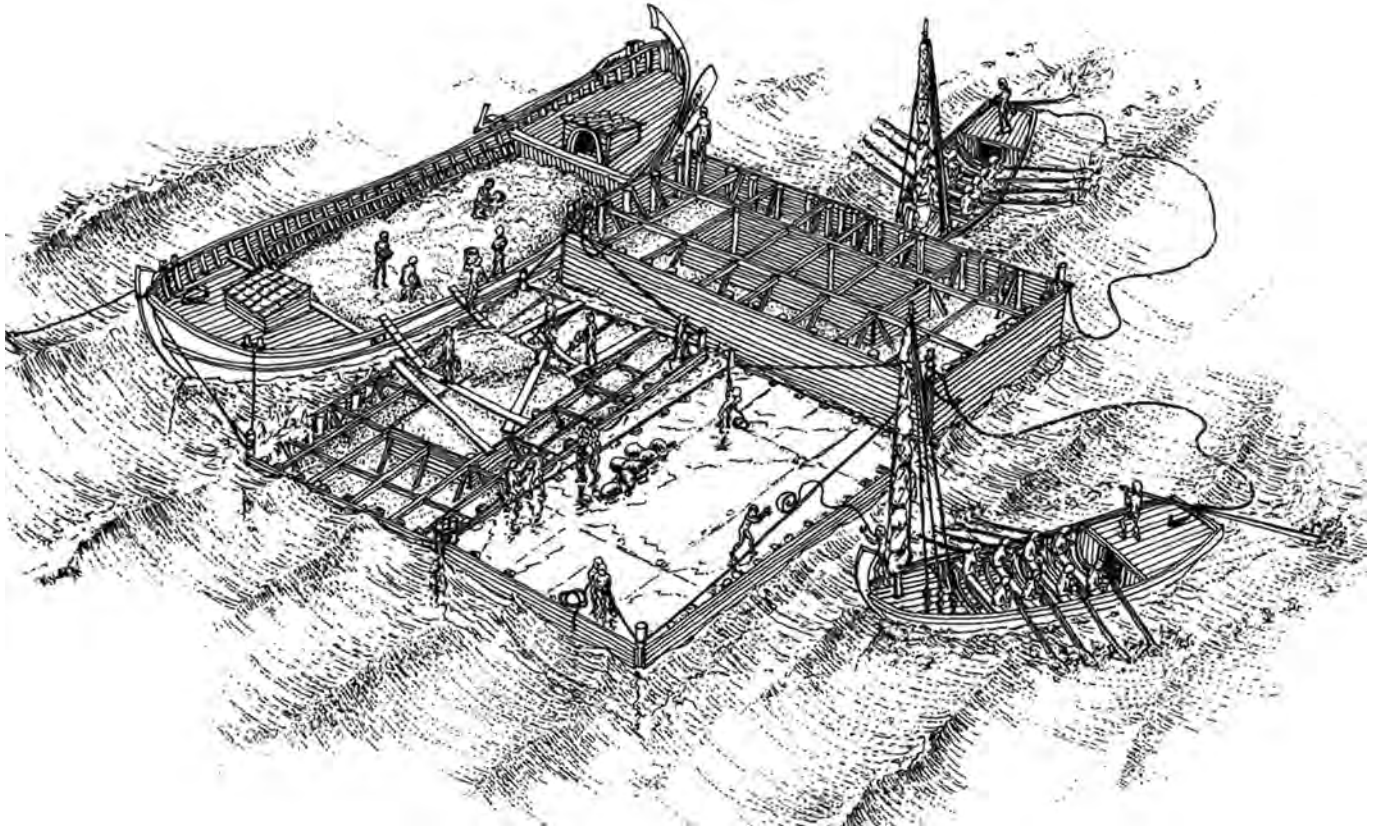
Reconstruction of prefabricated caissons being positioned and loaded with concrete at Area K at the northern end of the main enclosing mole at Caesarea (C. J. Brandon).
